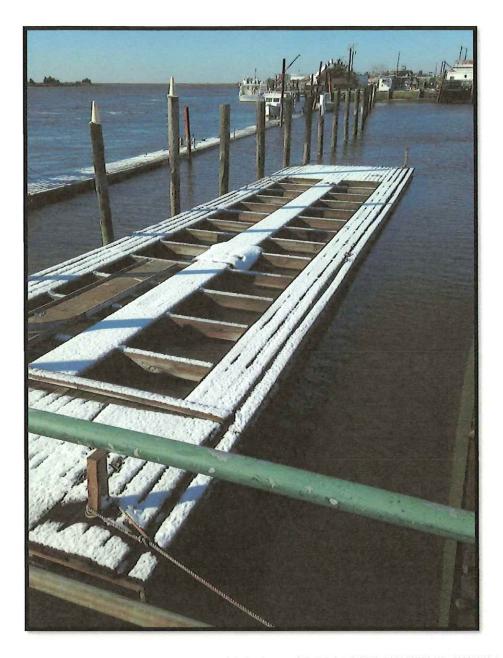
FLOATING DOCK FRAMEWORK FOR PROPOSED UPWELLER SYSTEM.
